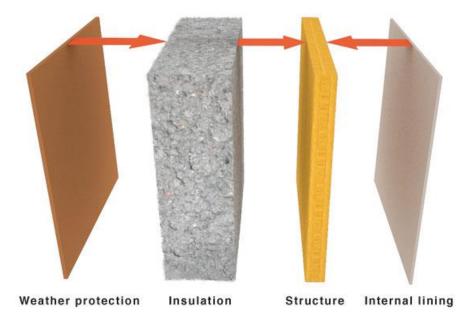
CLT walling assembly. (Adapted from Greenspec)
